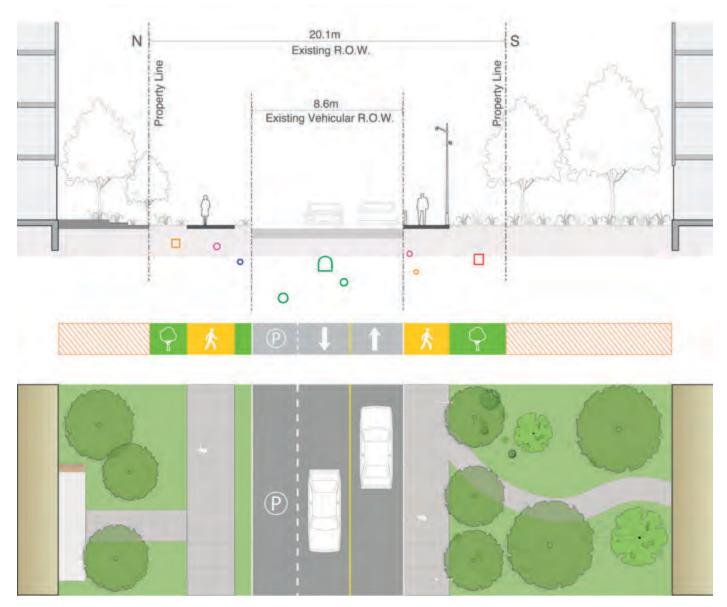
Section and Plan of the Existing Conditions along Balliol Street
